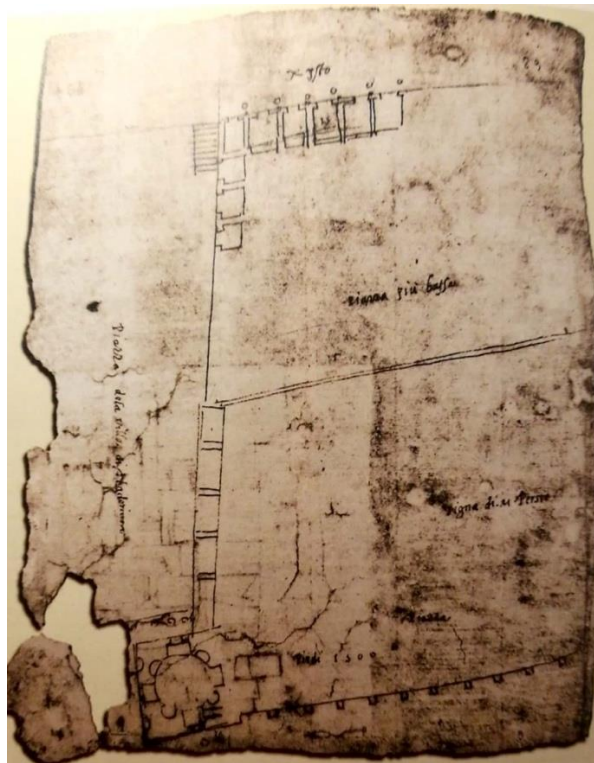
Plan of Roccobruna and surrounding areas by Pirro Ligorio.
